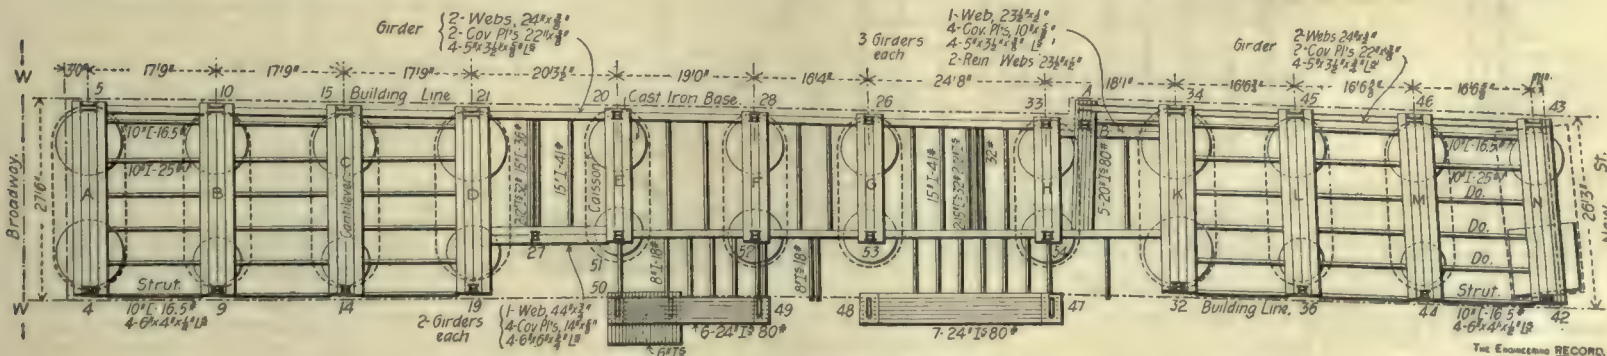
FOUNDATION AND CELLAR FLOOR BEAM PLAN.
